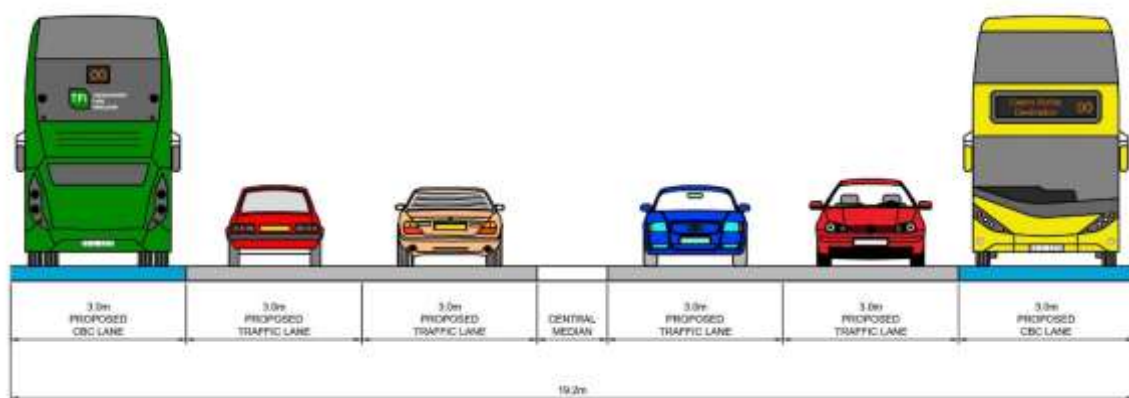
Typical National Primary Road Cross Section (A-A)
